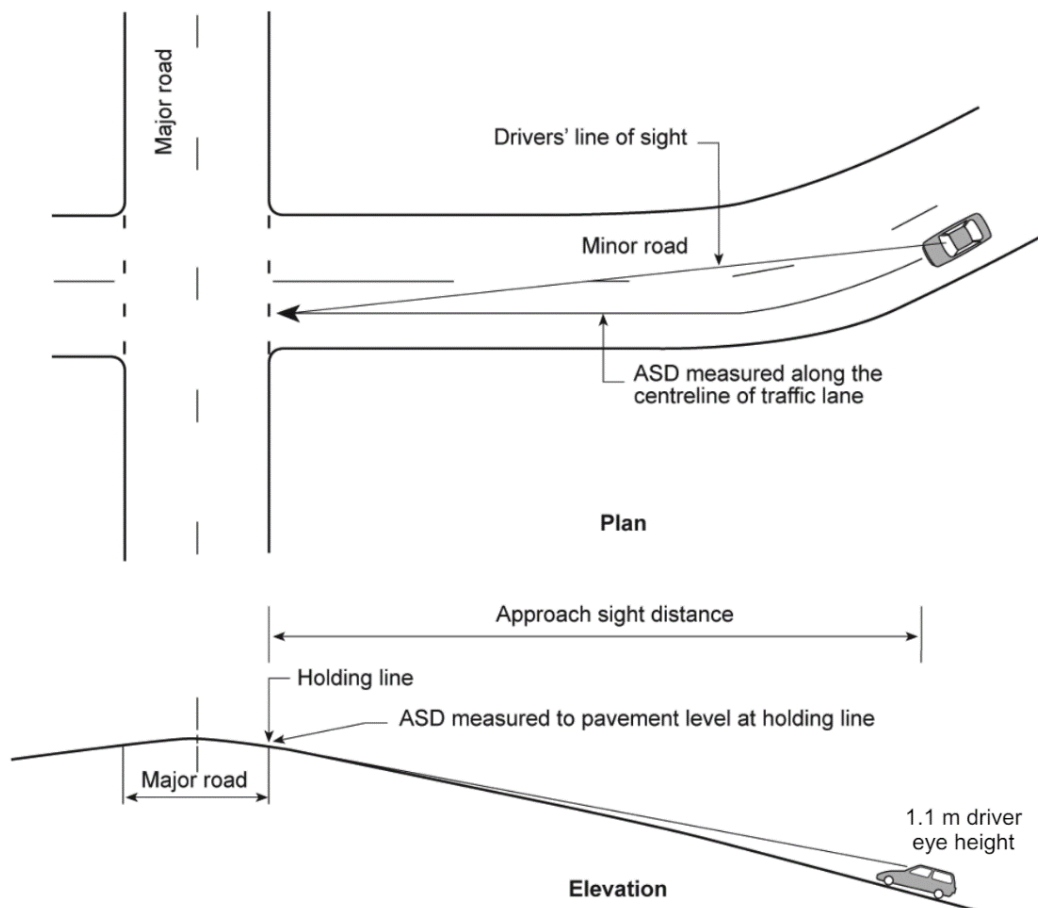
Assessing SSD (Source: Austroads Guide to Road Design 3)
